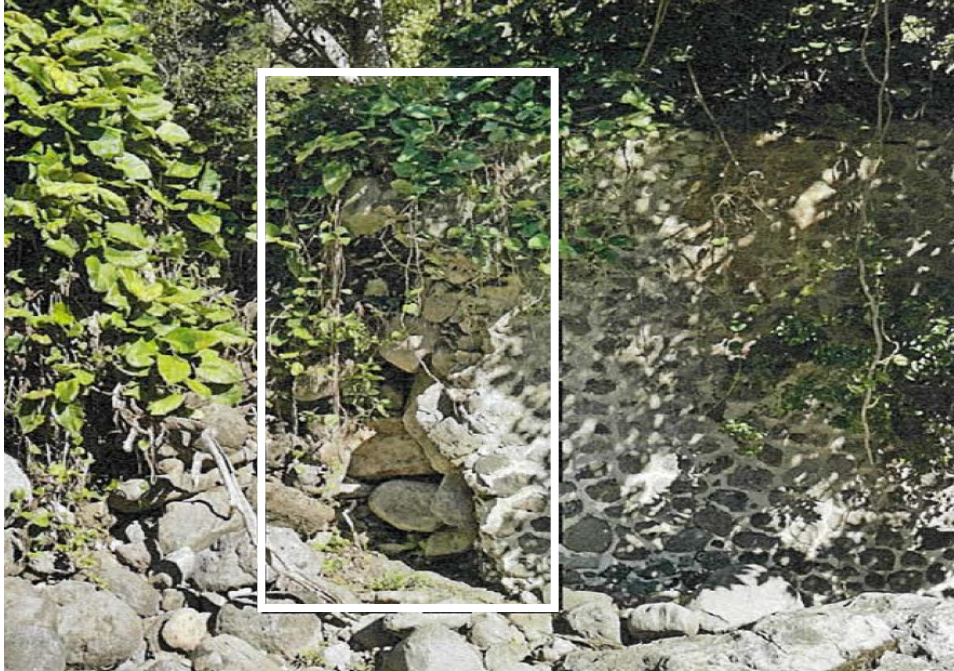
A photo of an eroded portion of the masonry wall to be repaired.
